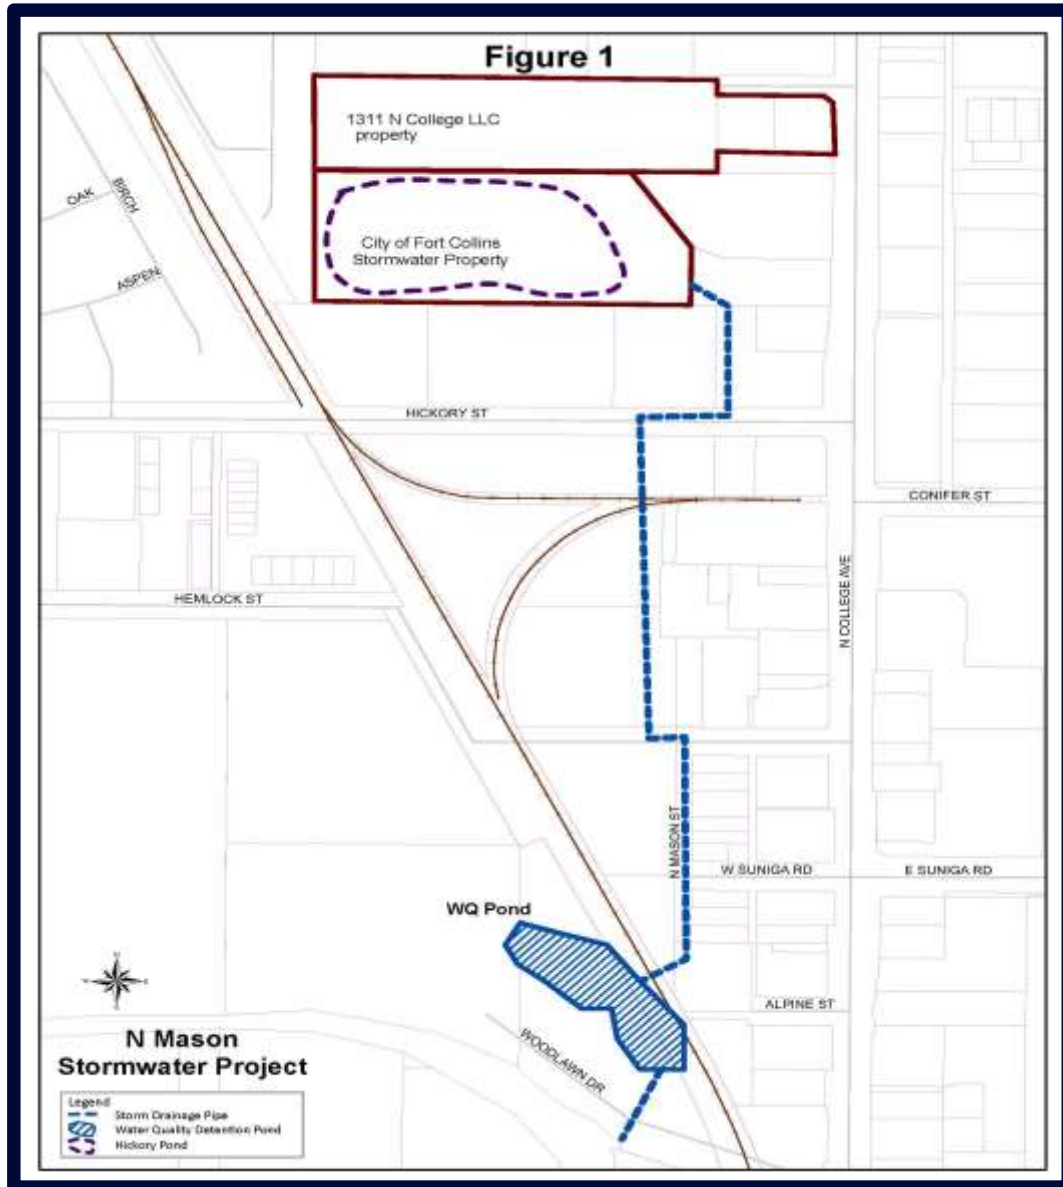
Shows a Schematic Drawing of the North Mason Stormwater Project (Phase I)
